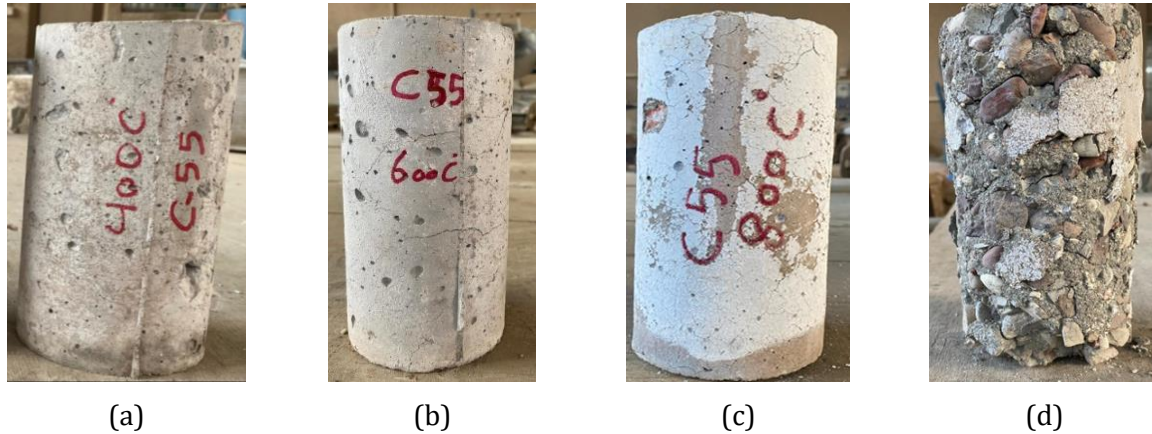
Compressive strength tested specimens of C-55 cylinders after heating: (a)T400, (b) T600, (c) T800 before aging, (d) T800 after aging
